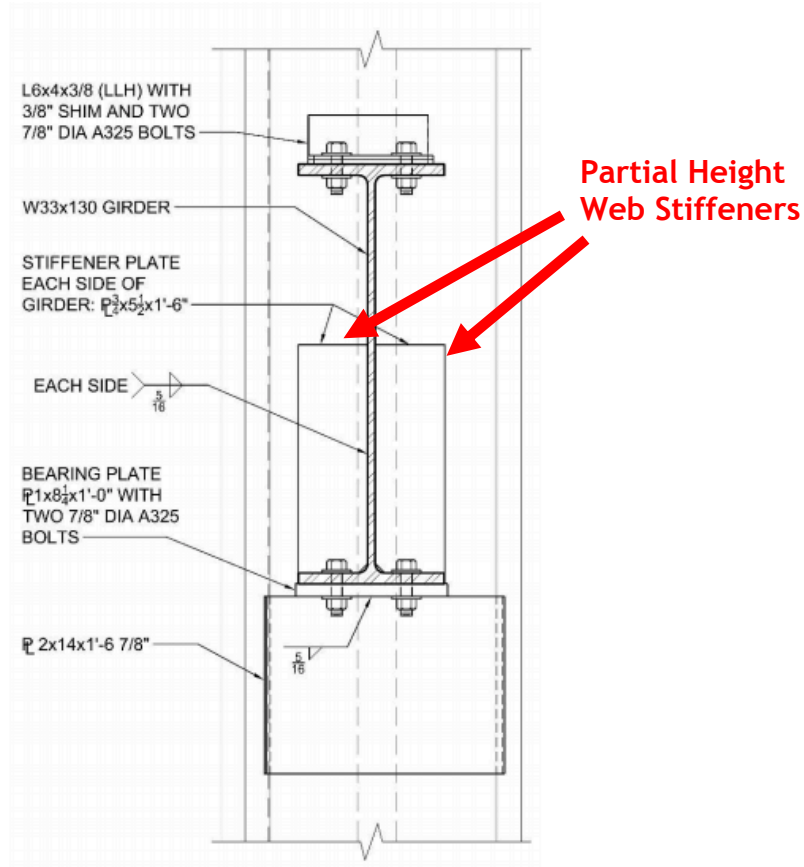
Section View at Floor 13, Column 79 Seated-Beam Connection
